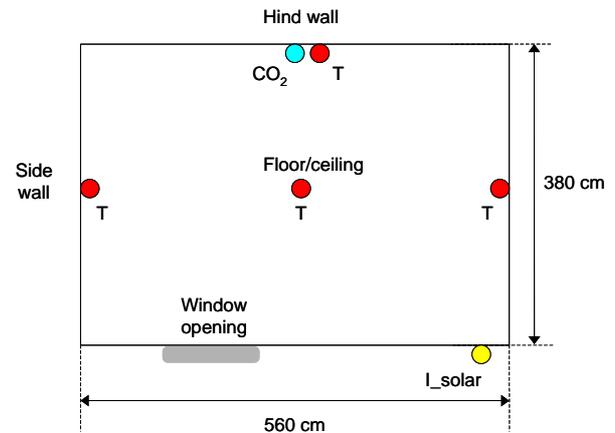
Floor plan of a room with the location of sensors. Sensors on the hind wall and side walls are placed at a height of 1.5m.
